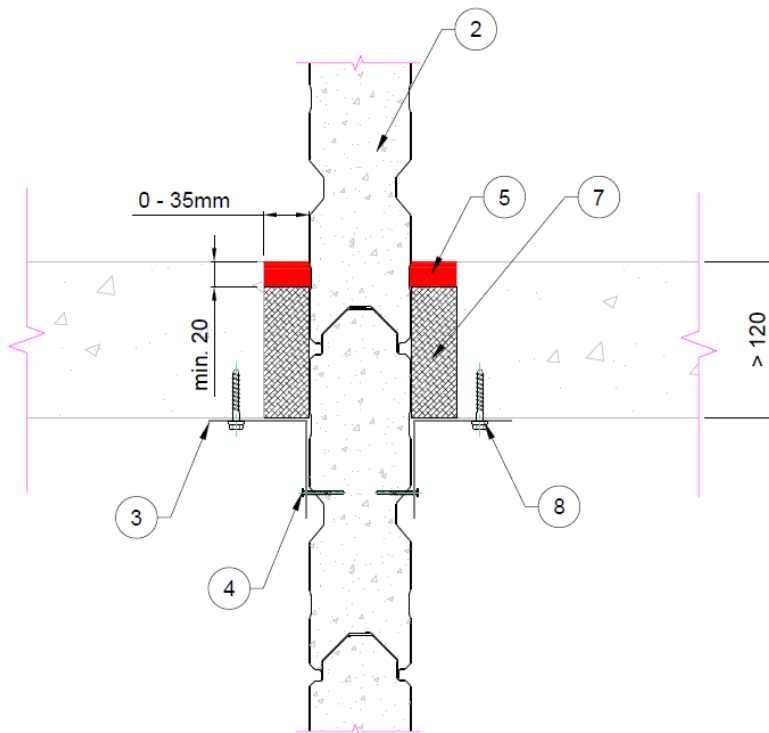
Wall-to-stair Joint (0-35 mm gap)
